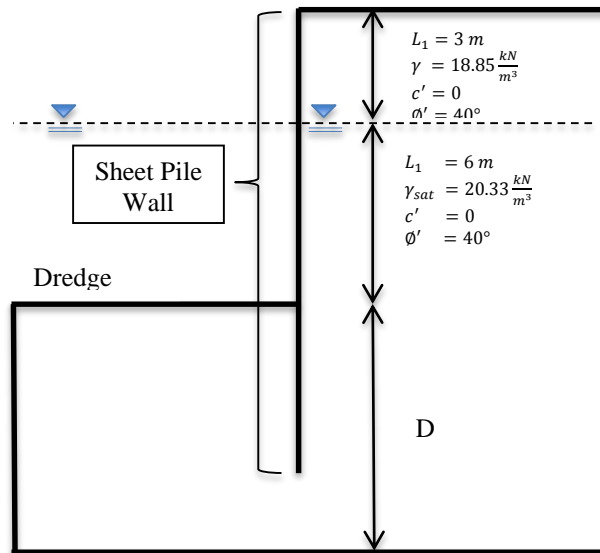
Cantilever Sheet Pile Problem Definition (Das 2007)
